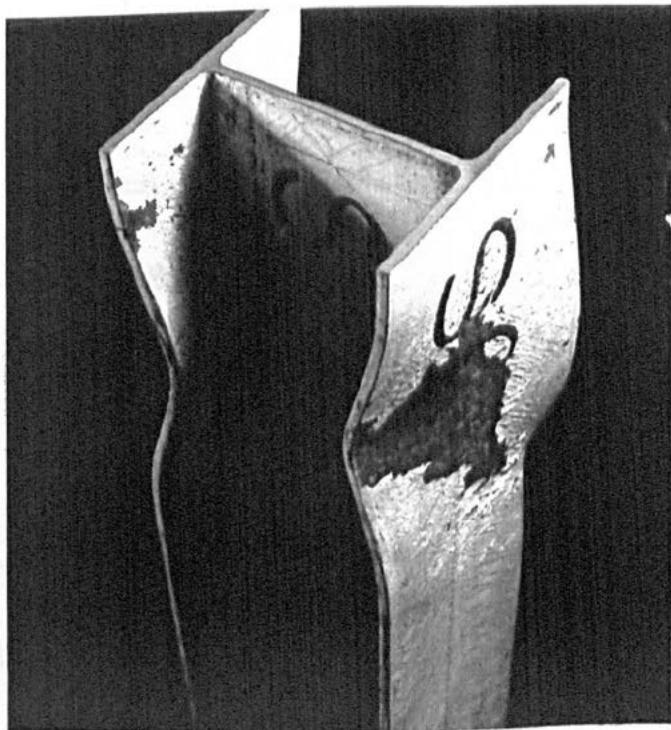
Photograph of a stub column specimen which exhibited excessive flange buckling.
